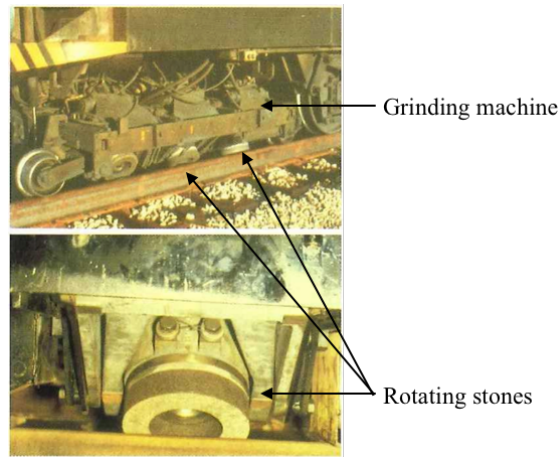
Grinding machine with rotating stones (adapted from Esveld (2001, p. 353))
